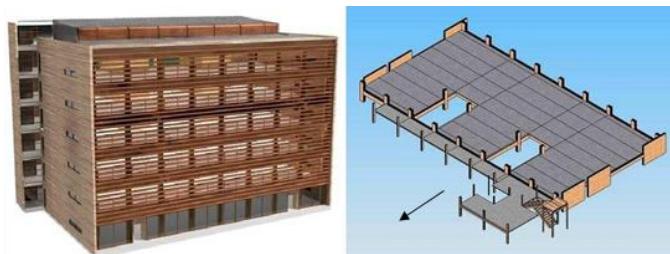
Original concrete building (courtesy of Courtney Architects)
